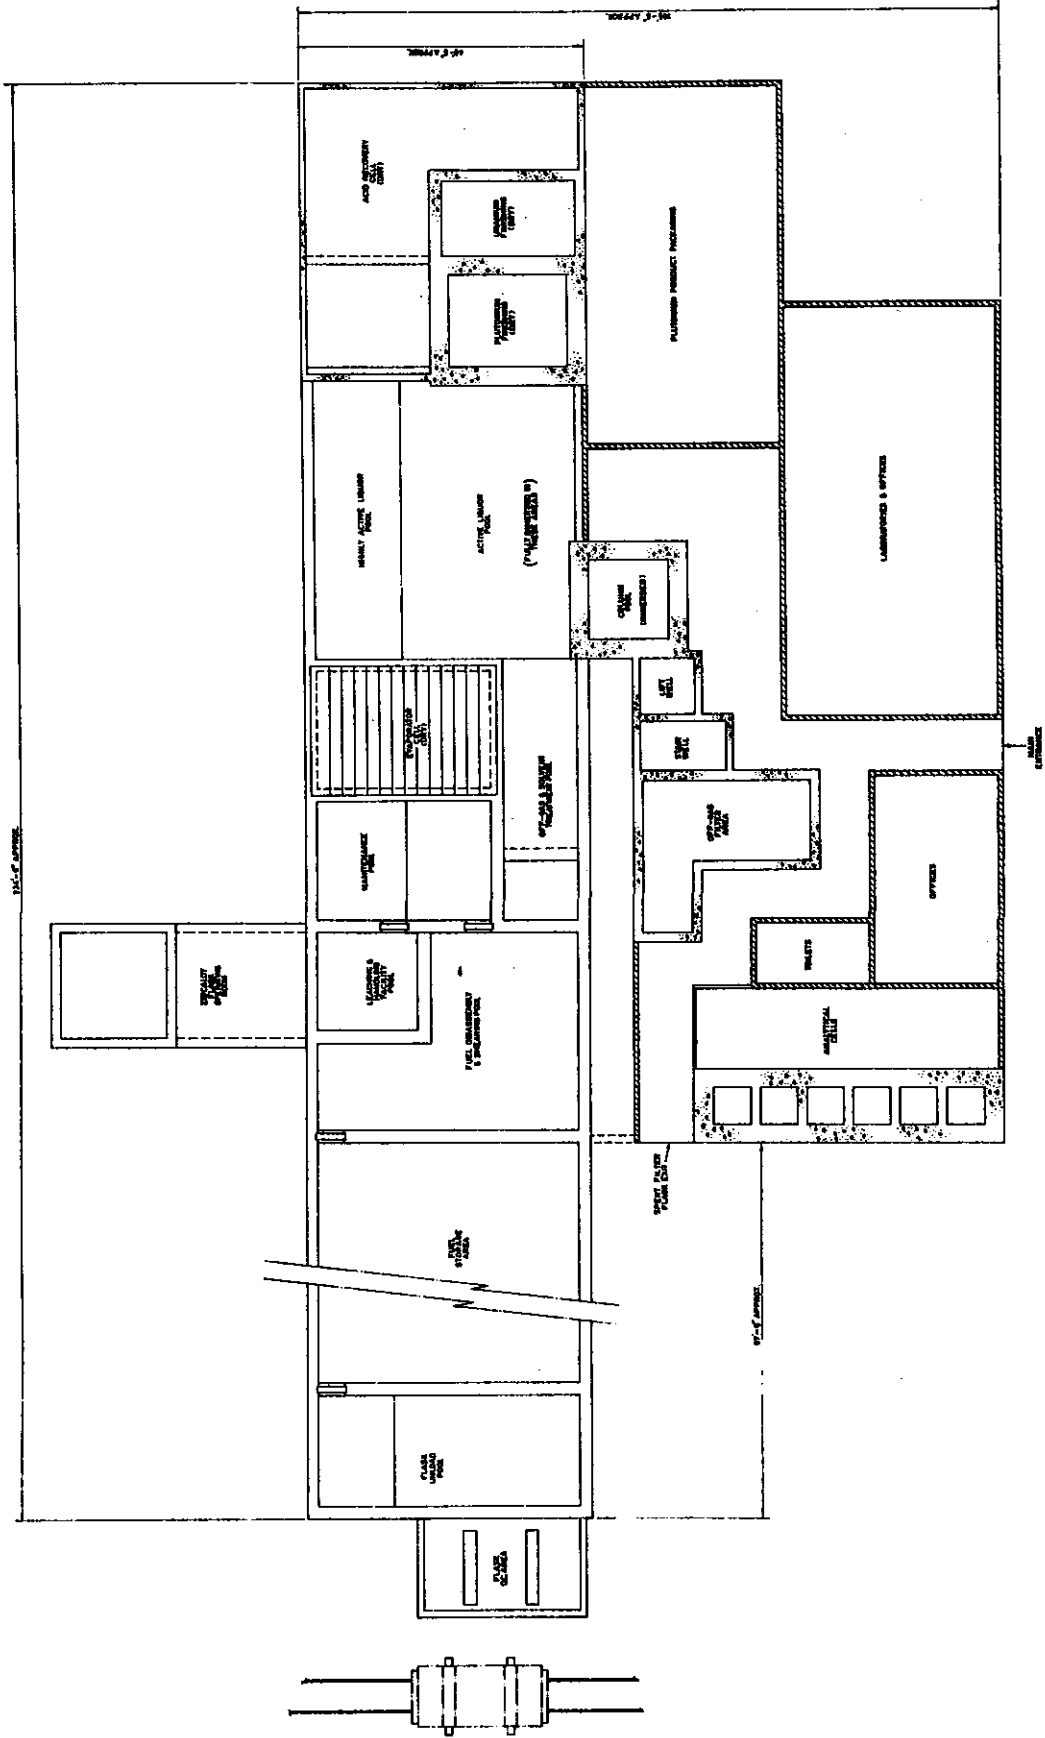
BUILDING LAYOUT - PLAN AT 0 ft
